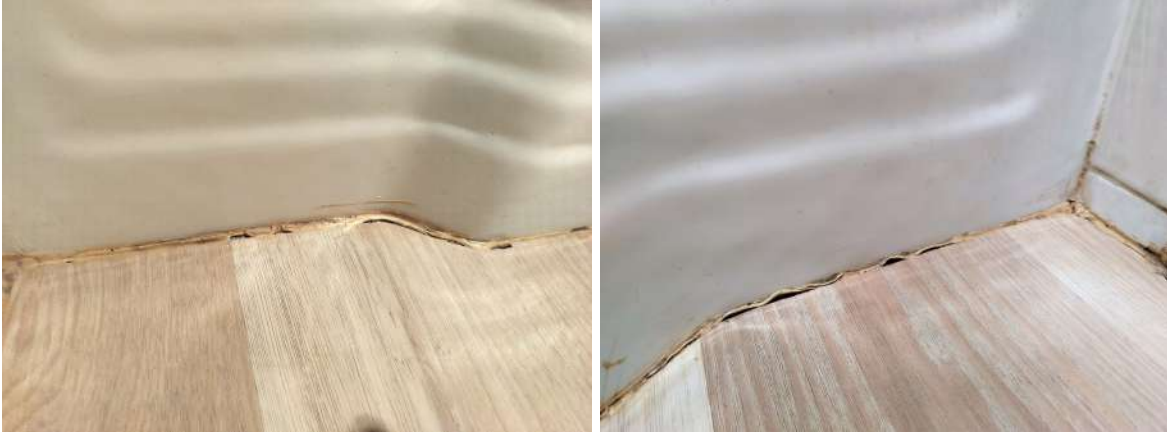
[PHOTO: Current condition showing severe water damage and mold on wooden baseboards near tub]
